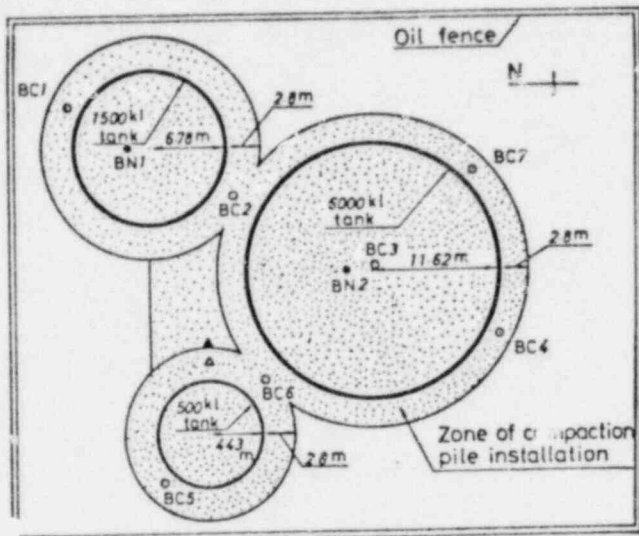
Zone of compaction pile installation and locations of drilling and sampling
